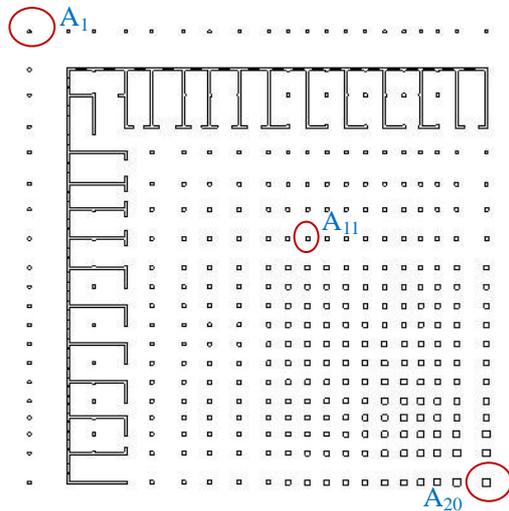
Quarter of the plan view at ground floor level showing column identifications
